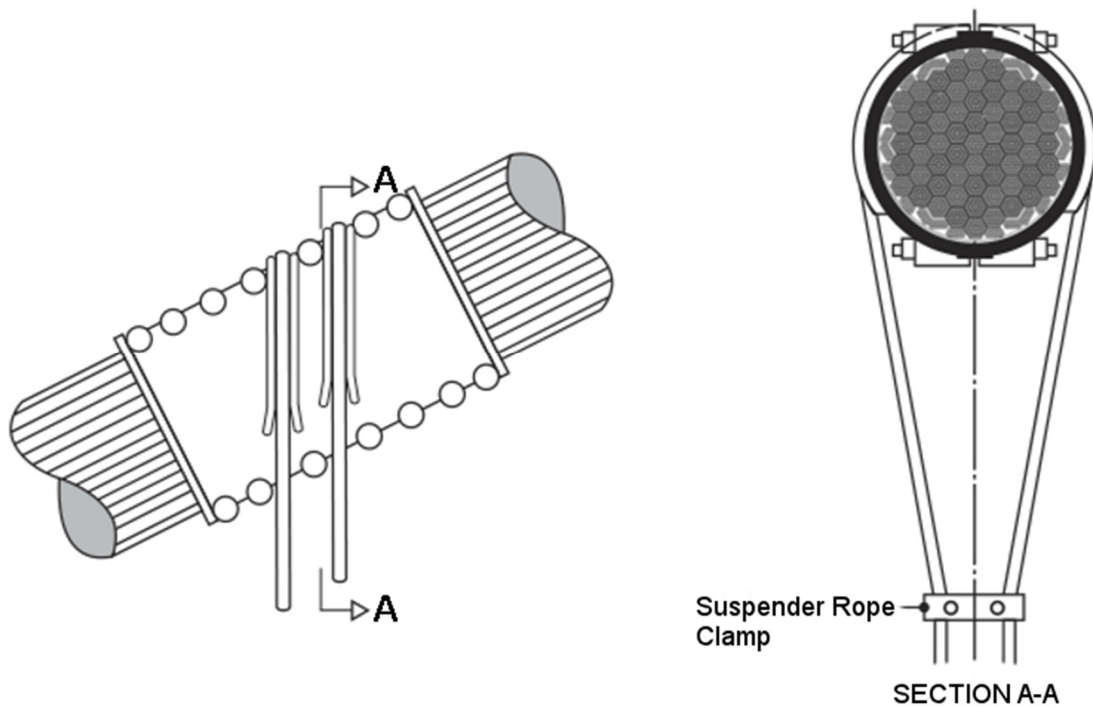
Left: Elevation - grooves on exterior face of cable band shown. Right: Section at the cable band. Suspender ropes looped around the clamp shown. Hanger clamps below the main cable may be provided to reduce the space between suspender ropes, as shown.
